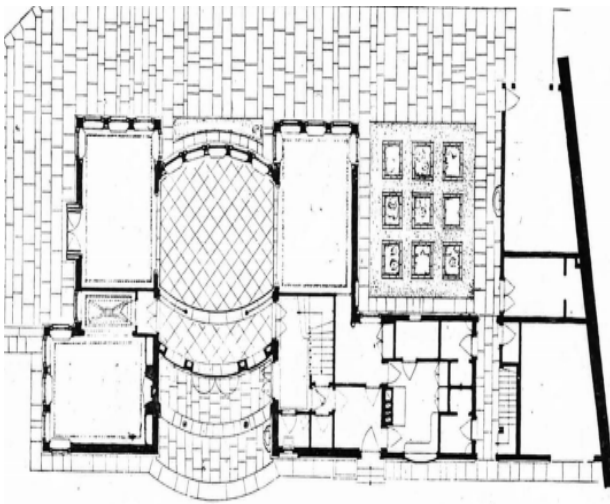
İlicak Yalısı (Plan: Eldem 1944, 148; Photo, Author)
